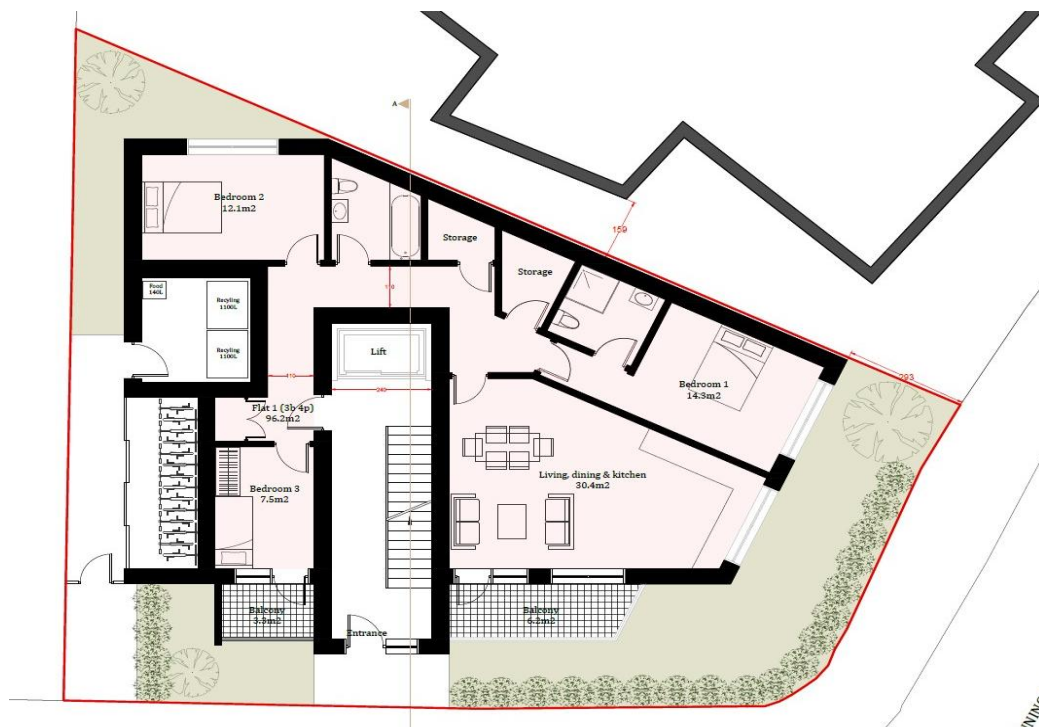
Proposed plan for the site designed by Aygul Boyraz Architecture & Interior Design LTD.
